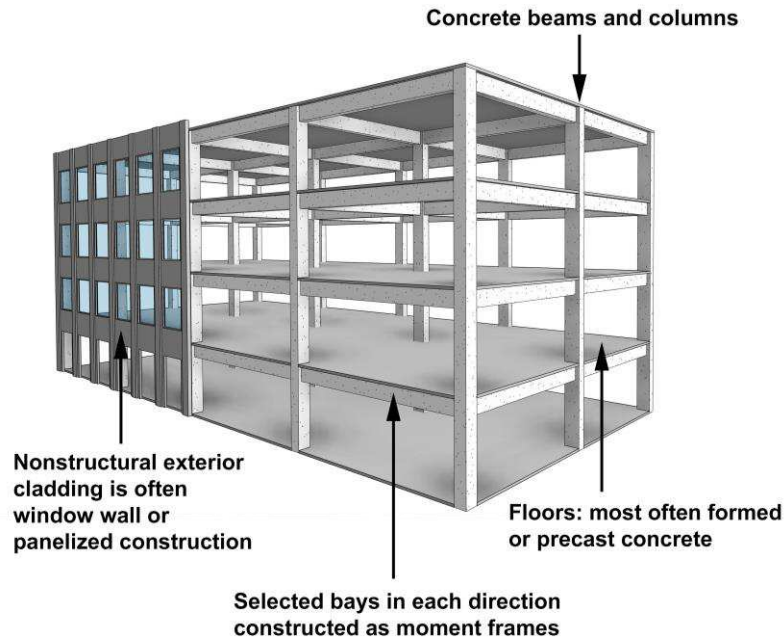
Schematic illustration of a CMF *building* (Figure adapted from FEMA 547, FEMA, 2006)
